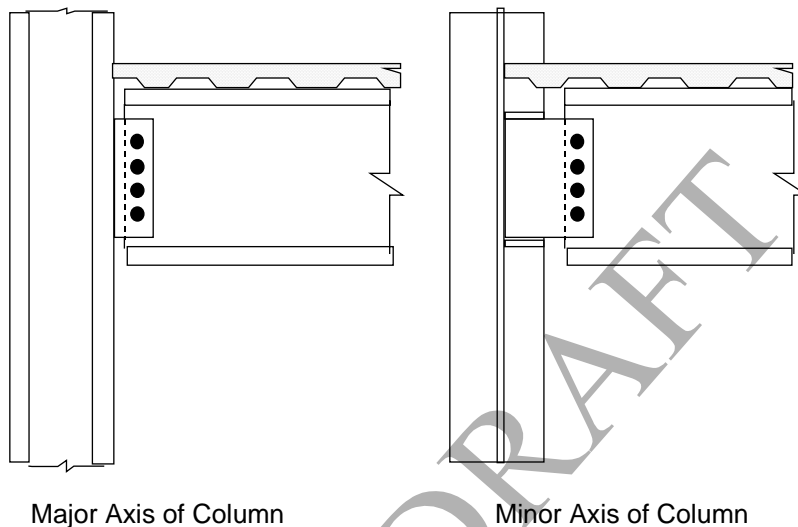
Typical Simple Shear Tab Connection with Slab
